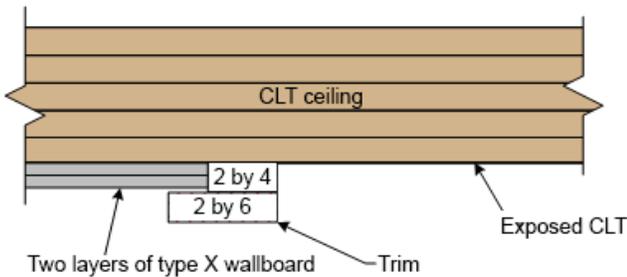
Trim added to exposed cross-laminated timber ceiling to protect edge of gypsum wallboard.
